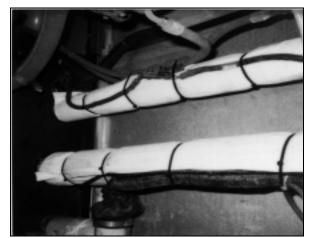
THERMAL PROTECTION AROUND CONDUITS
